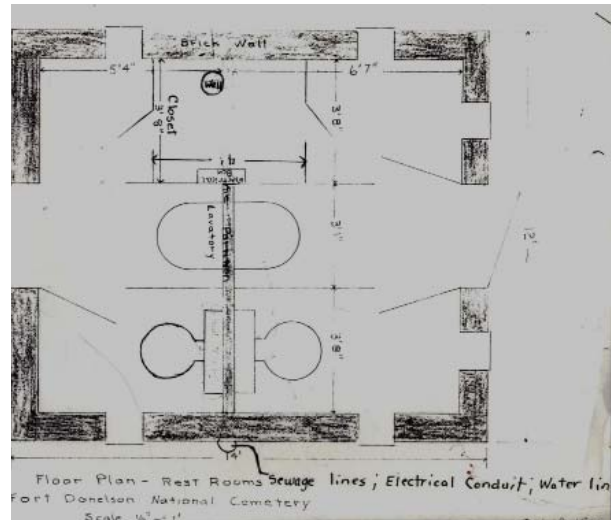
Interior plan for 1964 renovations shows door at each end, one toilet and one lavatory in each restroom. Partition is off-center, giving a larger space in the women’s end. (FODO collection)
